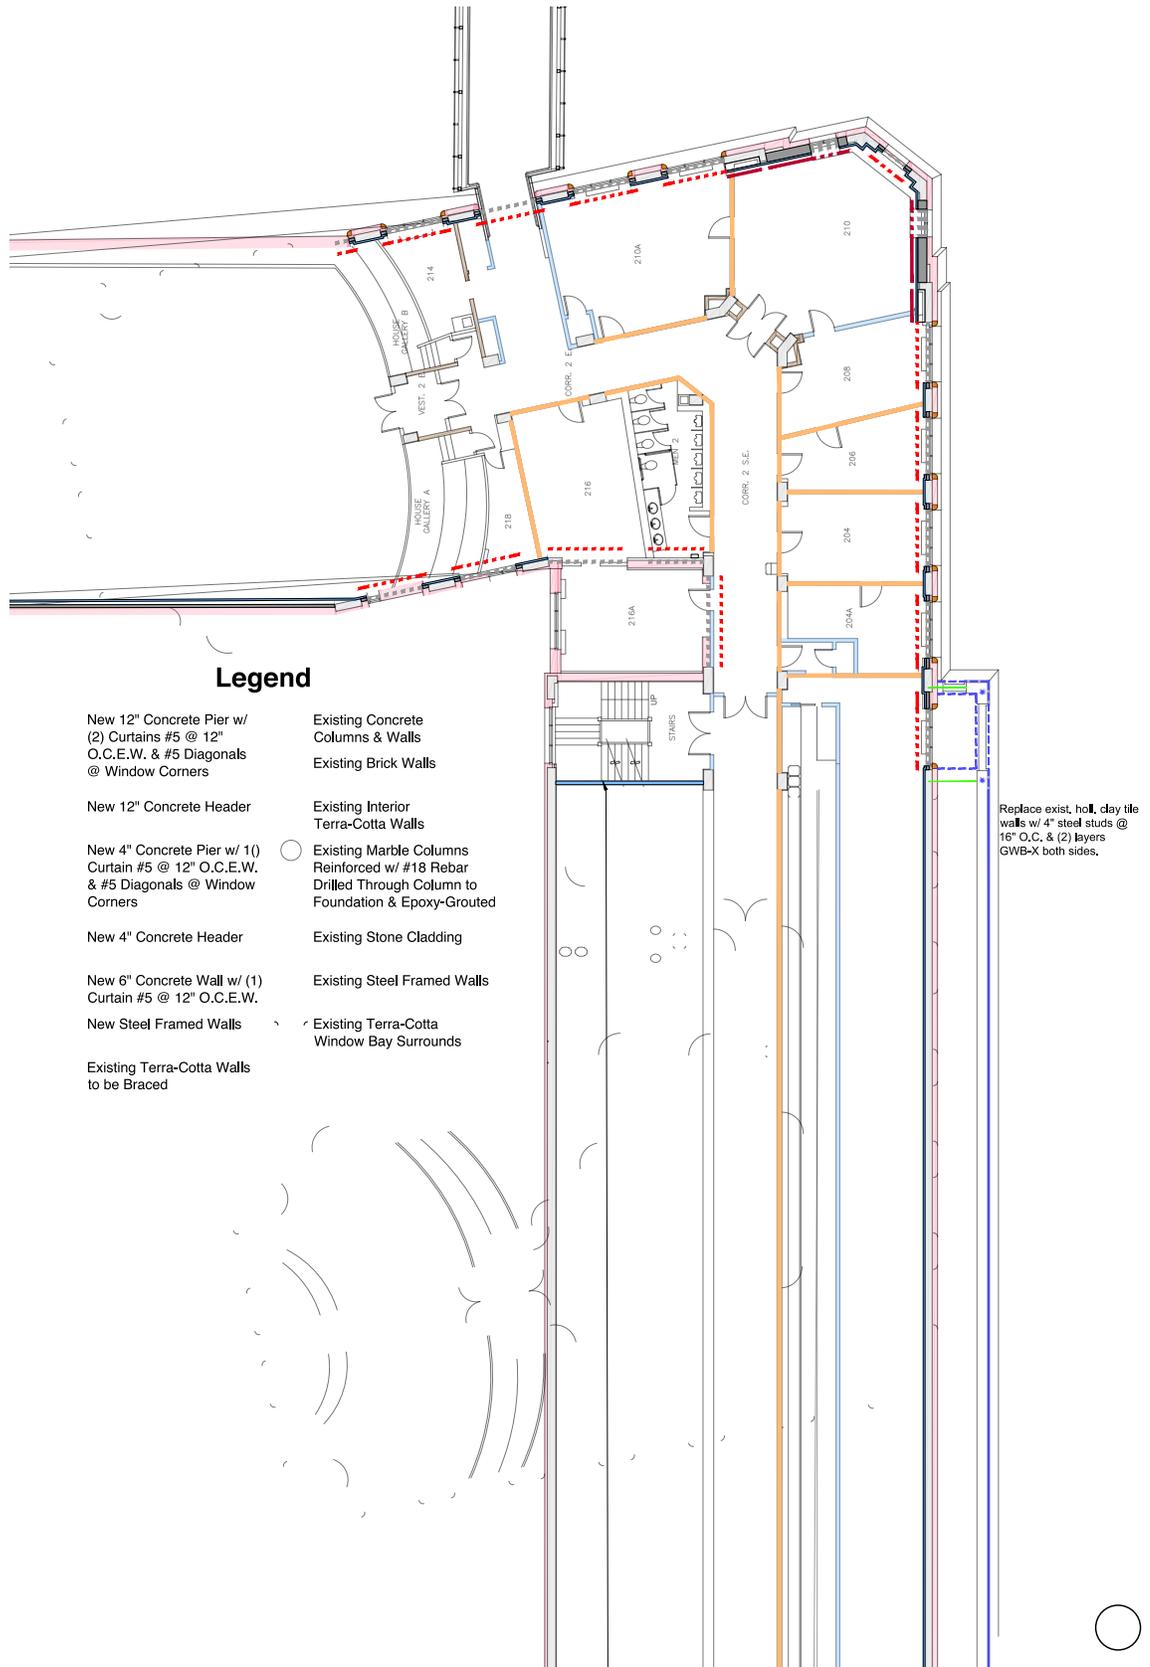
(4): Recom. HCT Wall Bracing/Replacement Locations-Floor Level 2
